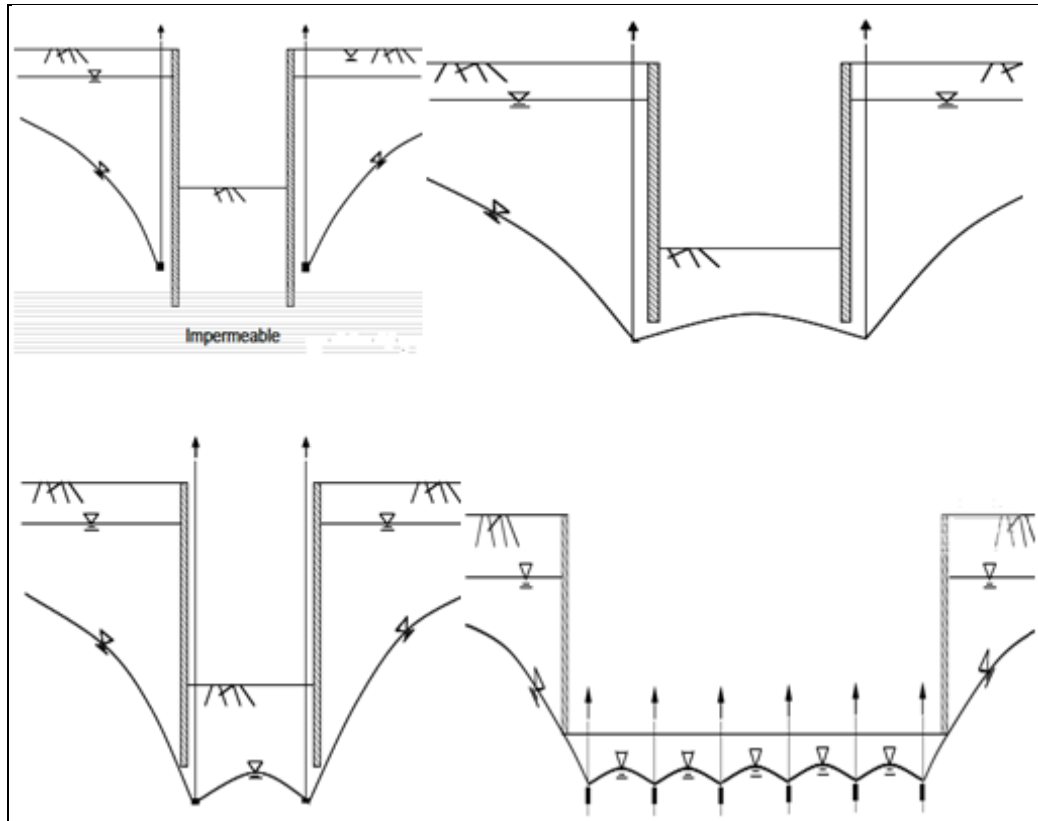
Ground water fluctuations due to pumping in soil for dewatering [59]
